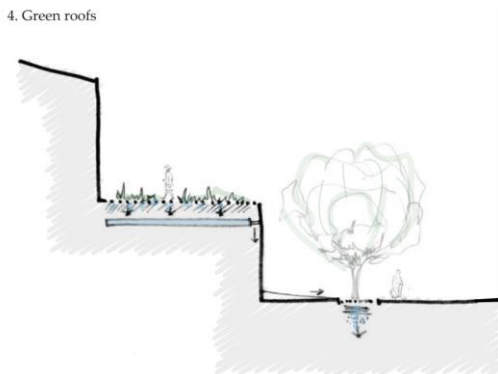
Green roof section (Silva, Costa, 2016). Figure 12. Vanhoever roof garden (Google Earth Image, 02/12/2023)
